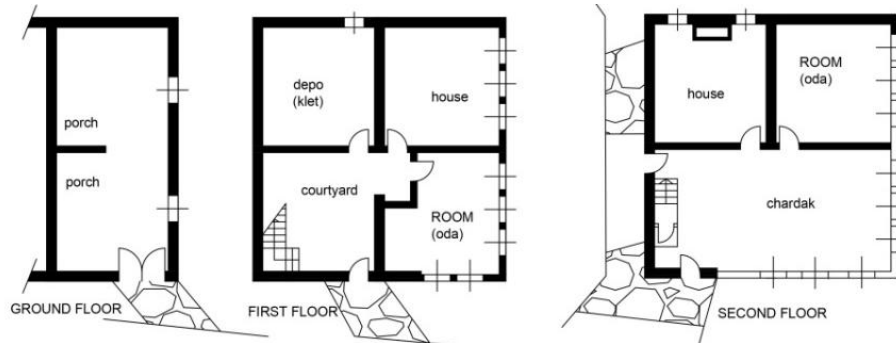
Typical floor plan of the vernacular house from the village Galicnik (Source: Authors archives 1998)
